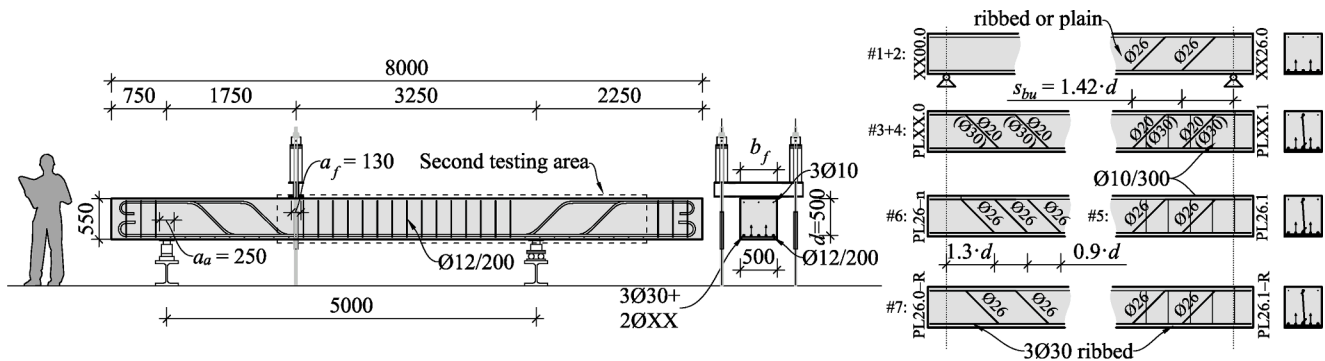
Test set-up and specimen details for shear tests with bent-up bars.
